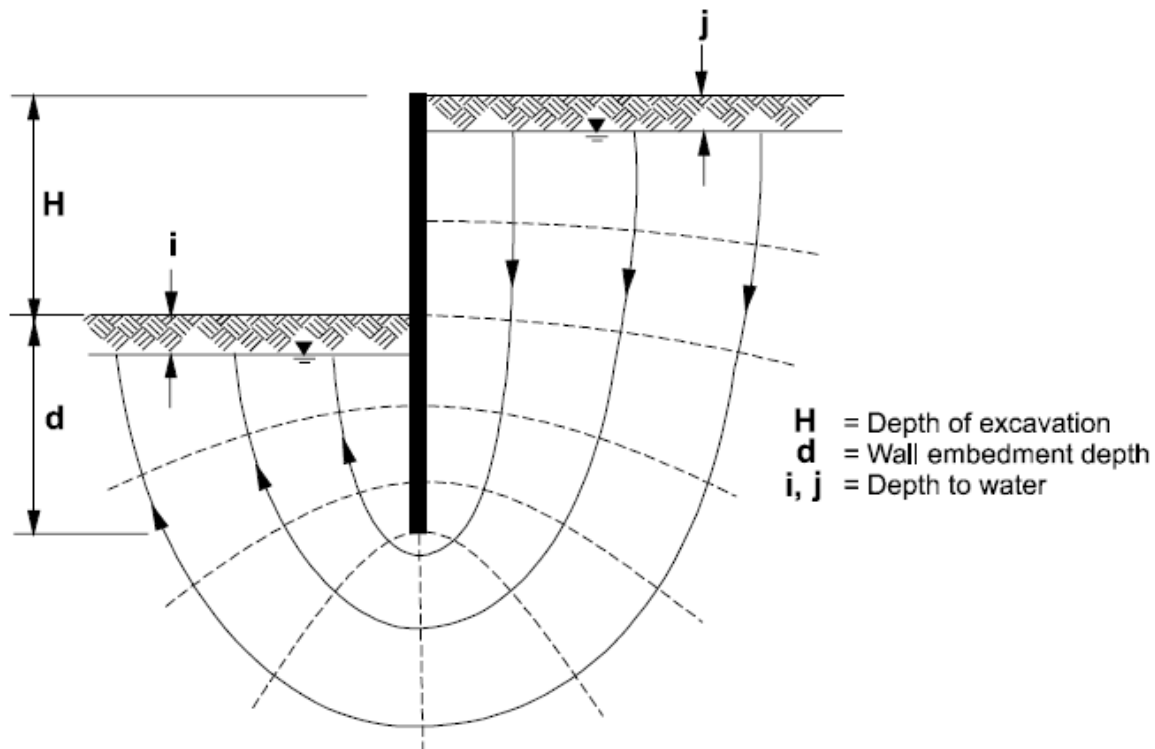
Flow net for a retaining wall (after CIRIA, 1984).
